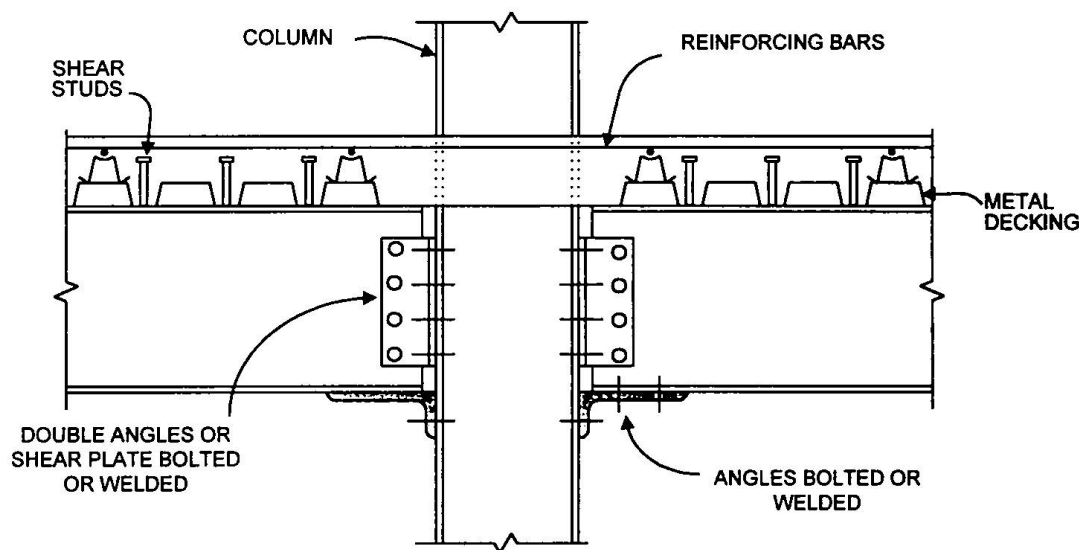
Typical partially-restrained composite connection (PR-CC).
